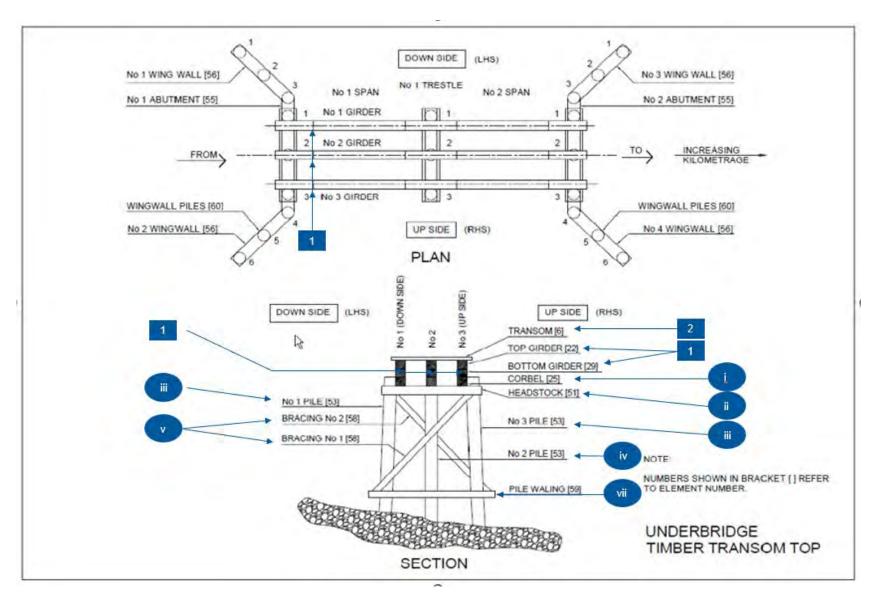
Typical timber girder bridge elements (Source: ARTC)
